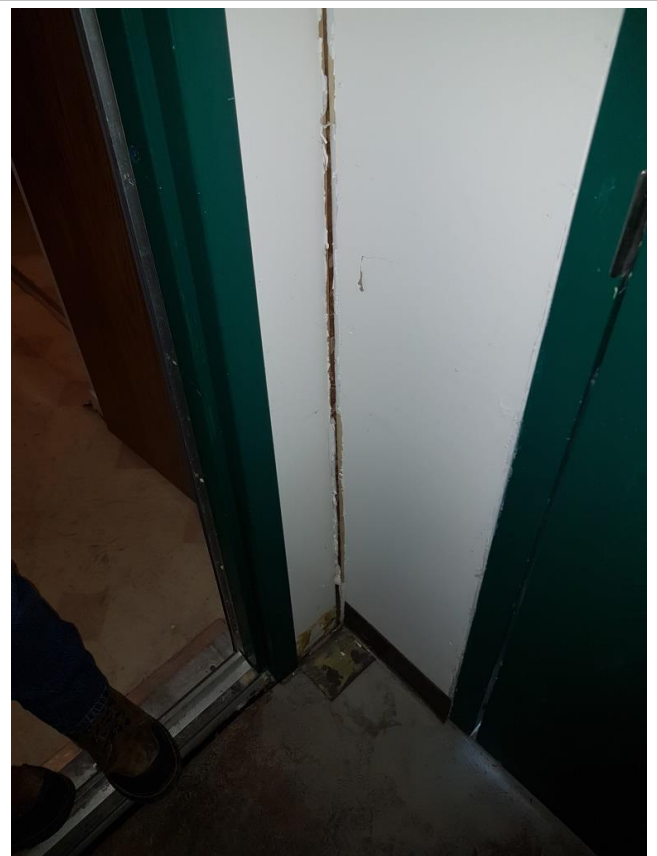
Trailer, Separation at Porch/Trailer Walls and Floor
